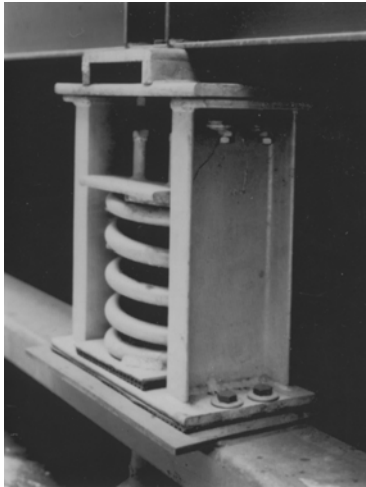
Faulty installation of a large equipment isolator with stanchion restraints. The spring top plate is touching the near stanchion and the equipment mounting plate is resting on the stanchions. Both conditions allow equipment vibrations to bypass the spring and enter the building structure through the isolator baseplate.
